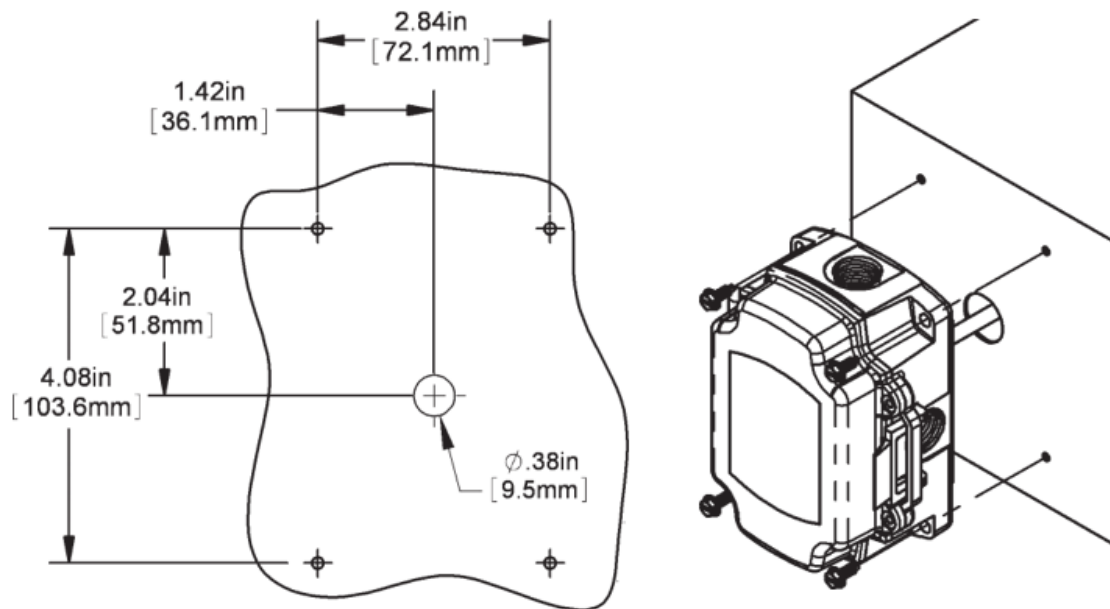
Enclosure Mounting Holes, Rotate 90° for Horizontal Mounting
